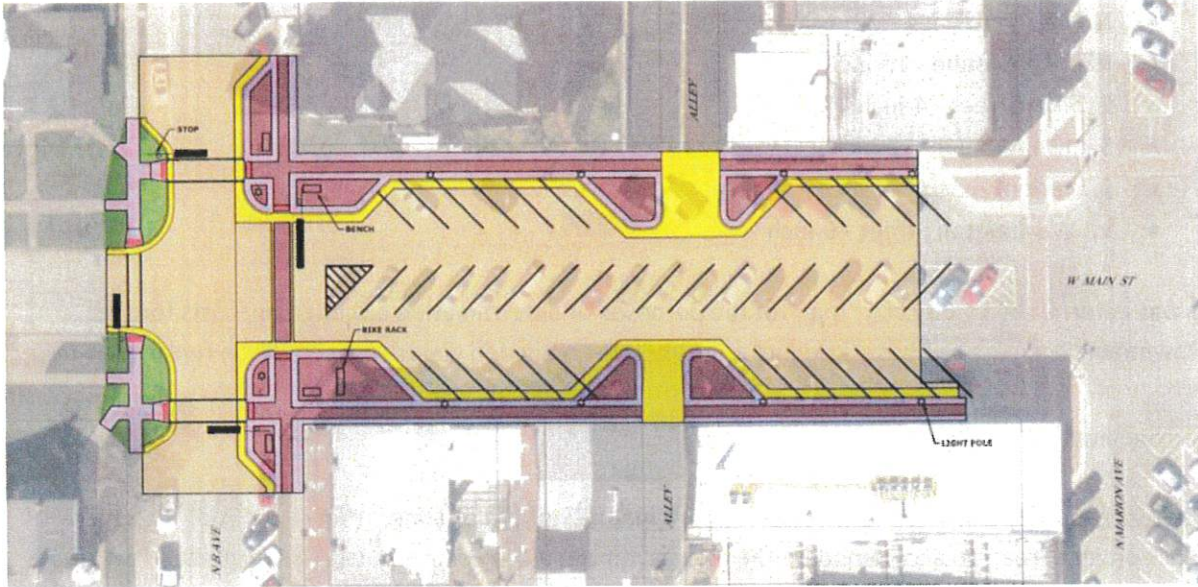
W. Main Street Area Downtown Streetscape Concept Plan
